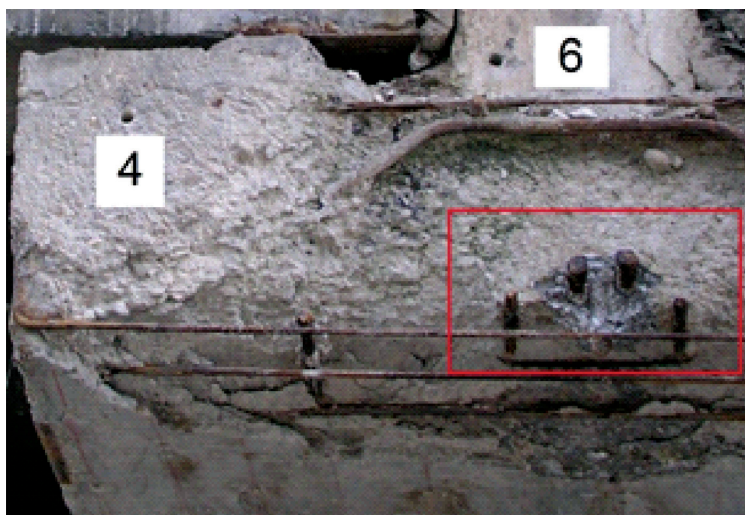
Drilling locations on the more corroded crosshead no. 15
